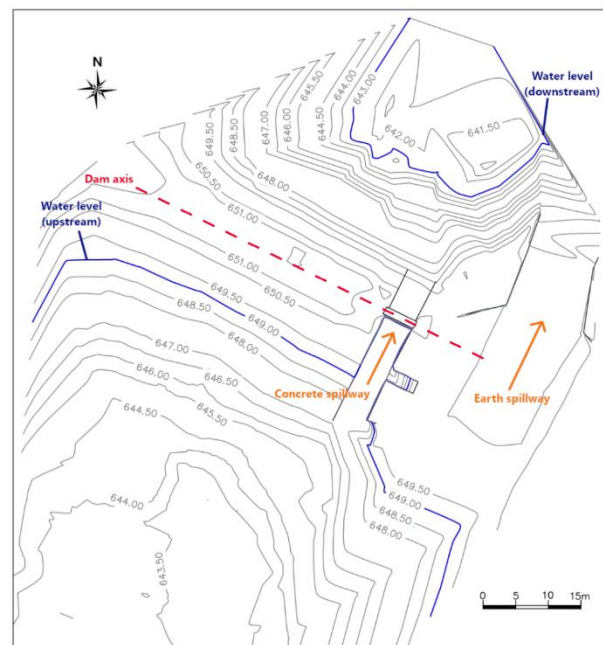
Detailed view of the contour lines and structures present on the dam (adapted from UFV, 2018).
